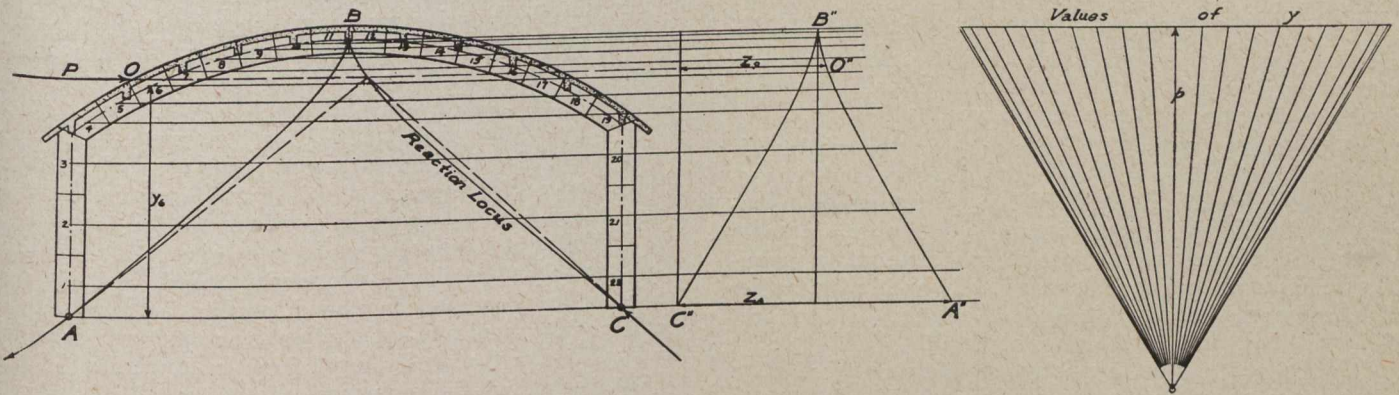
Reactions Under Horizontal Load—Two-hinged Arch.
